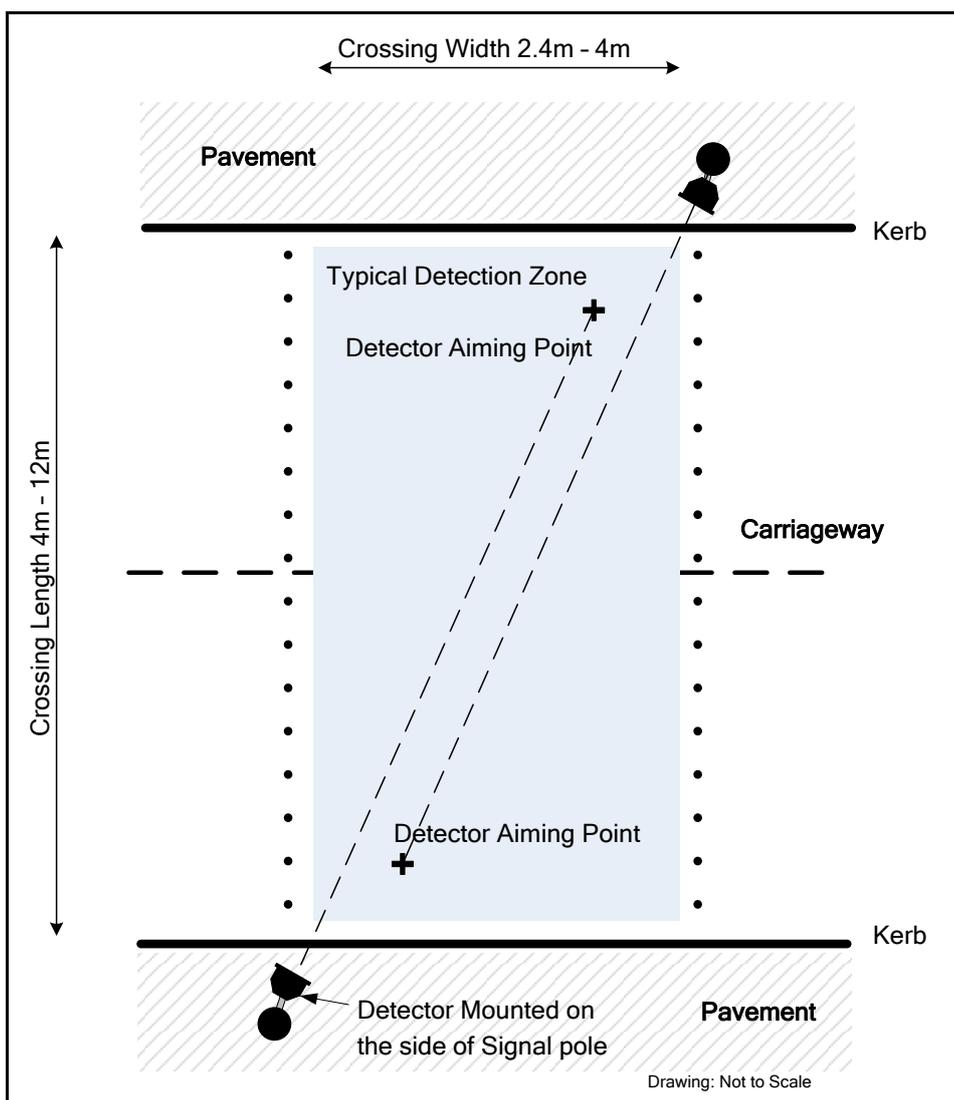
Pedestrian On Crossing Detector Installation – Plan View
